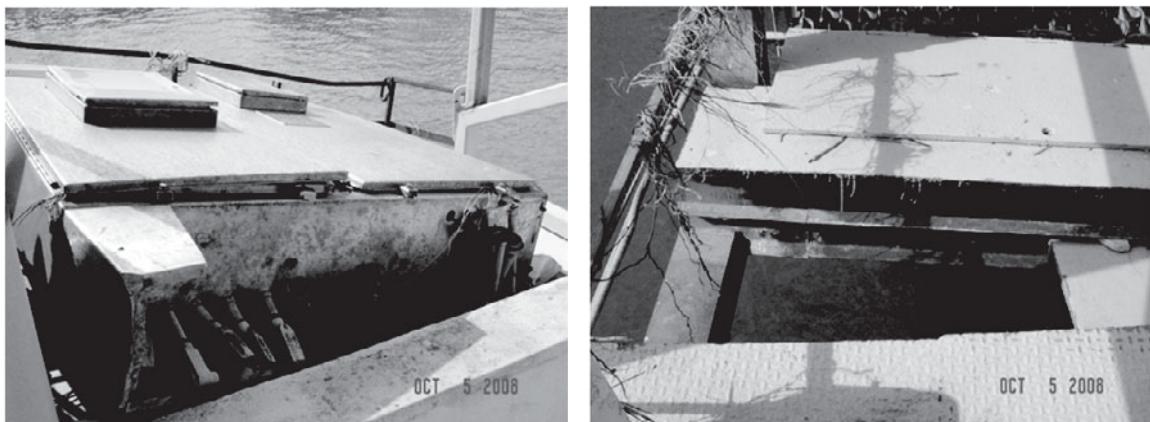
Minor damage to main facilities at Bolivar Ferry Terminal
